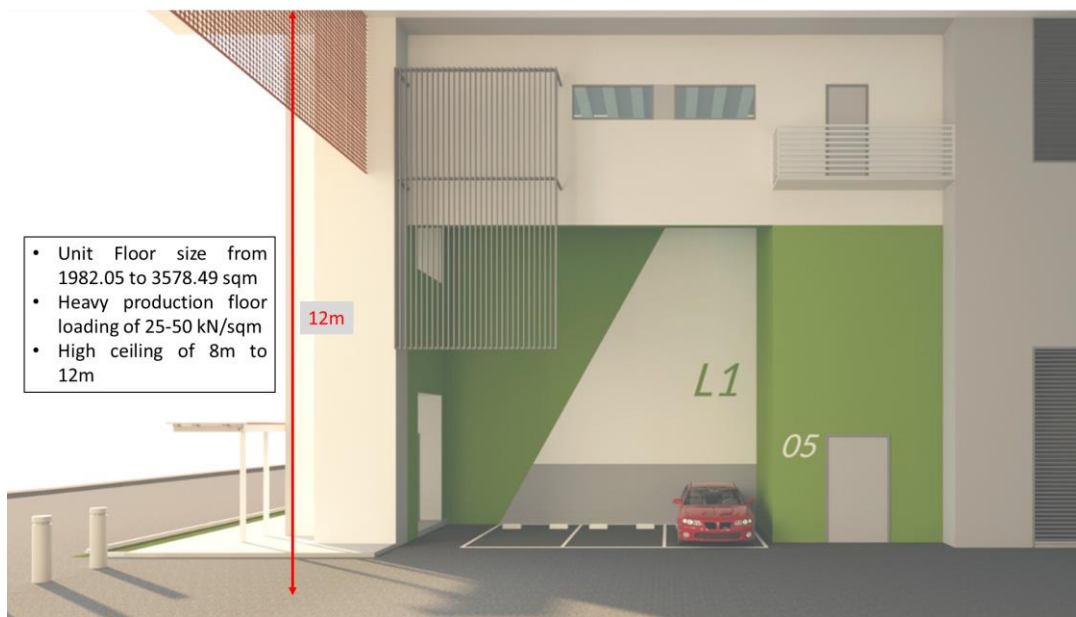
Kranji Green Interior Specifications Requirements²⁵, layout of the multi-story recycling facility in Appendix D.
